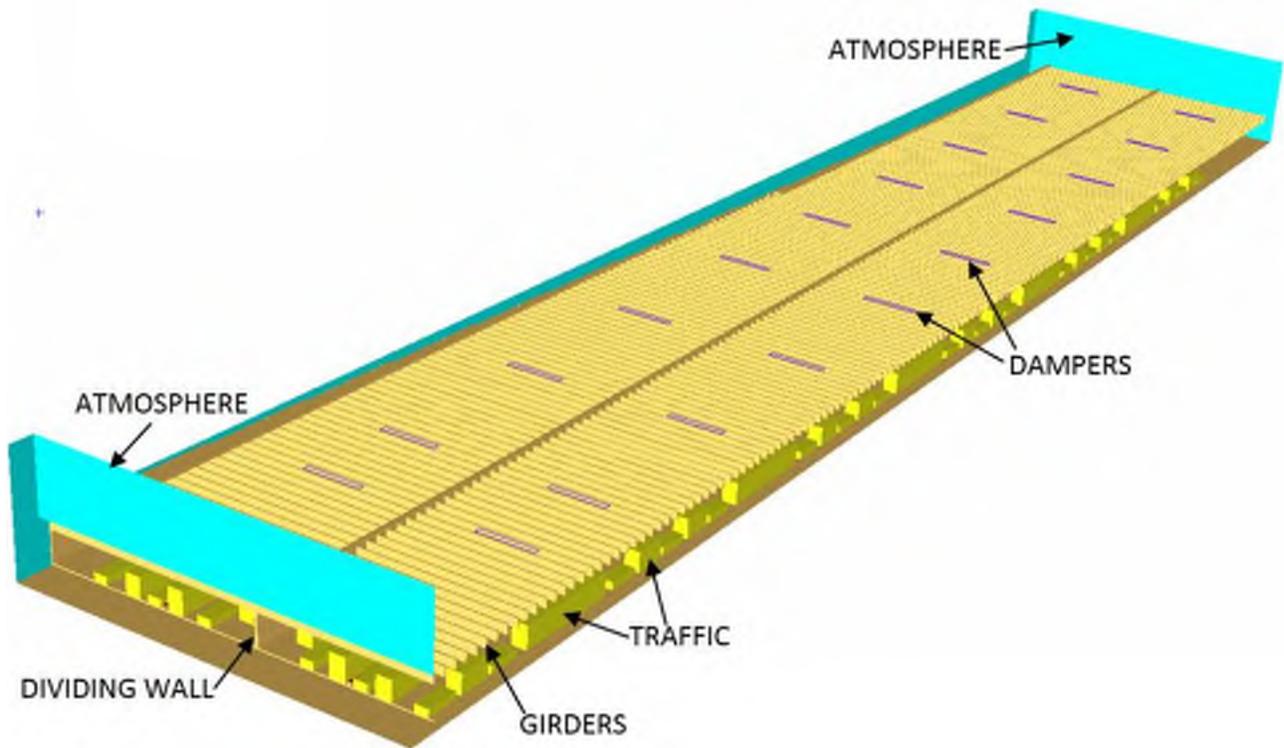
Isometric view of the CFD model showing the two tunnels with the dividing wall, congested traffic, girders and the dampers connected to the transverse ducts at the tunnel cover.
